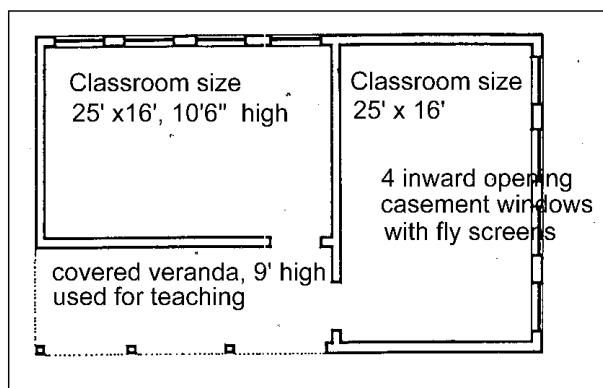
Plan of model school. Schools are brick built with reinforced concrete roofs
